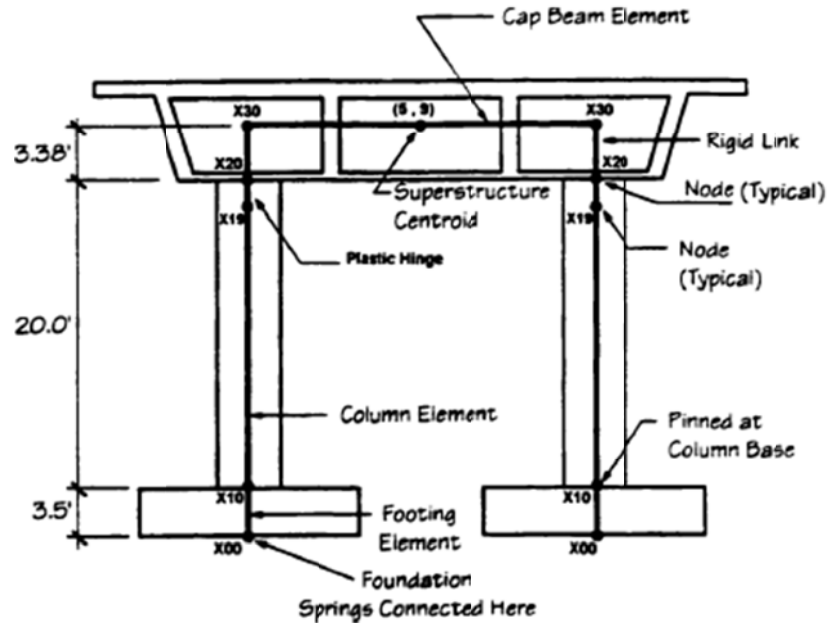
Bridge No. 2 – Details of Bent Elements
